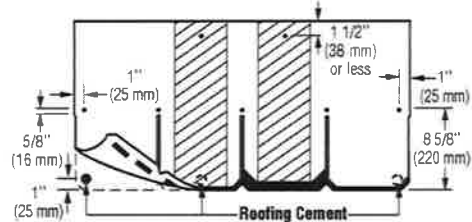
When installing Grand Manor Shingles on steep slopes, use seven nails and three spots of asphalt roofing cement.
